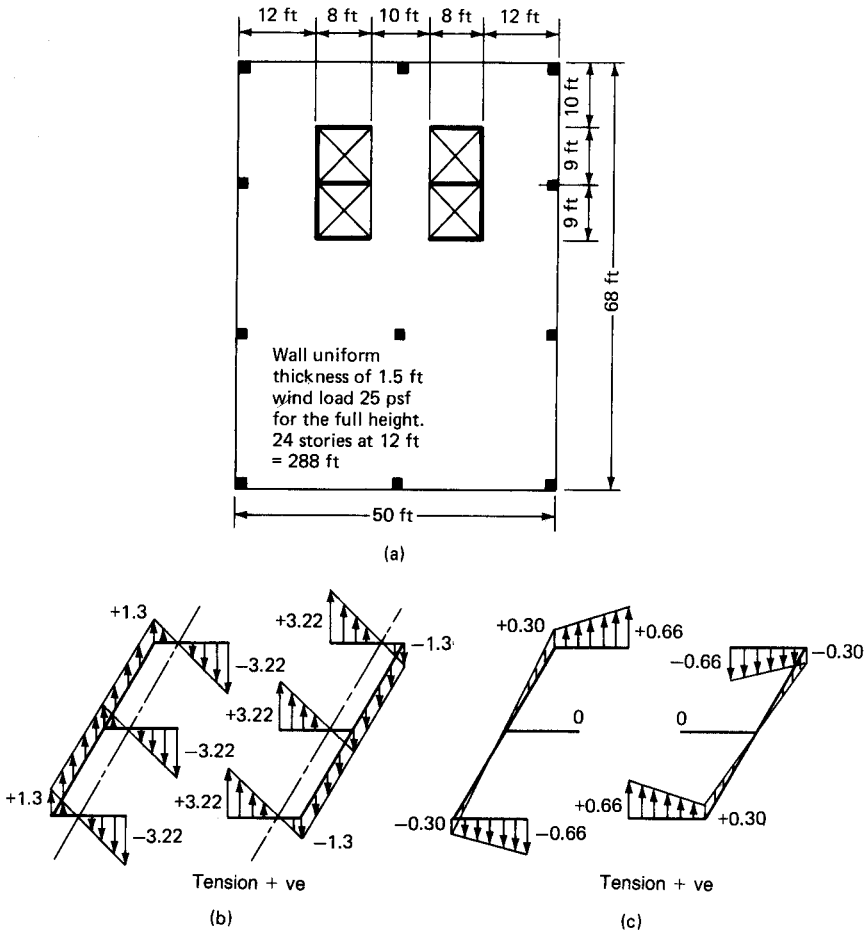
(a) Practical twin-core building; (b) dimensions and loading; (c) bending stresses, ksi; (d) warping stresses, ksi.
